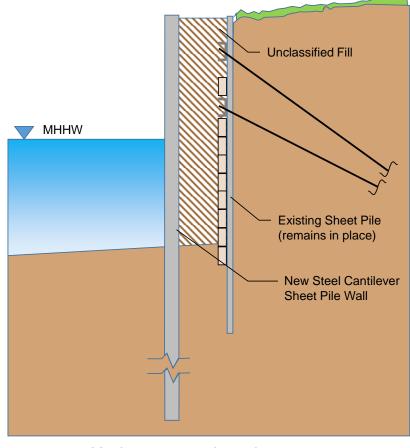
Concept 4 - New steel sheet pile wall schematic.
